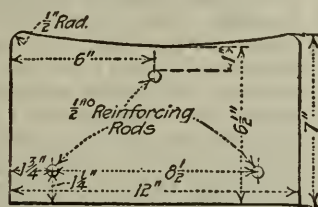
CROSS SECTION OF CONCRETE RAIL
